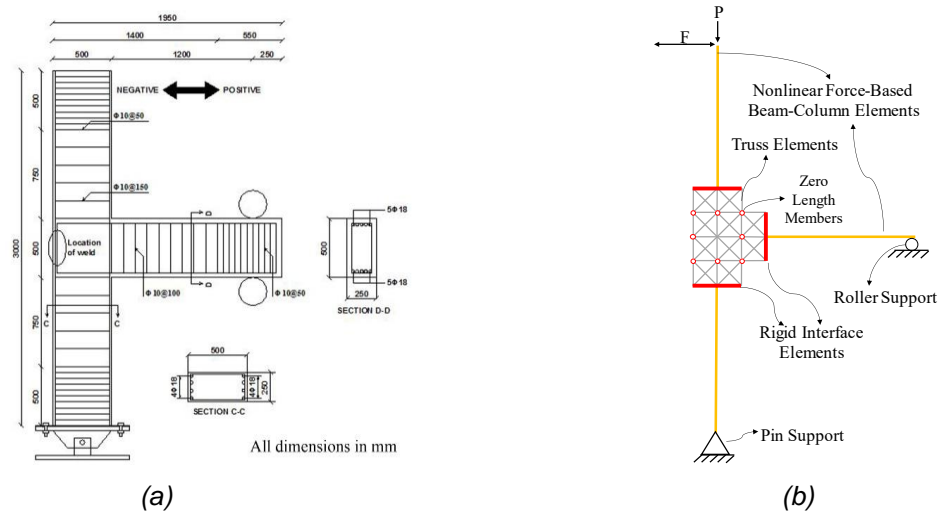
Details of the specimen EJ-R (a) dimensions and reinforcement details of the specimen EJ-R (b) general layout of the EJ-R model
